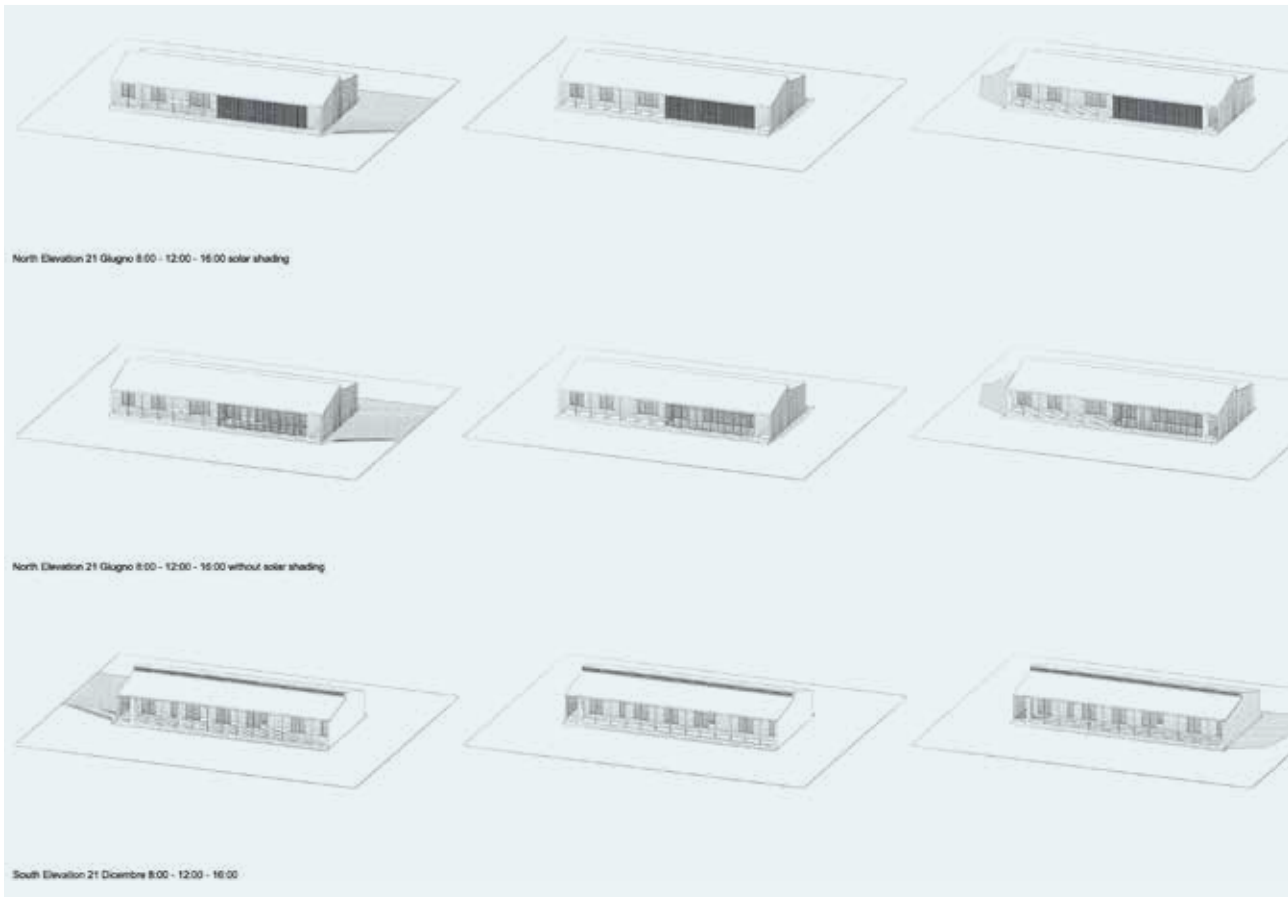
SINGLE-STOREY RESIDENTIAL BUILDING IN UPLAND CLIMATE (ELEVATIONS)
